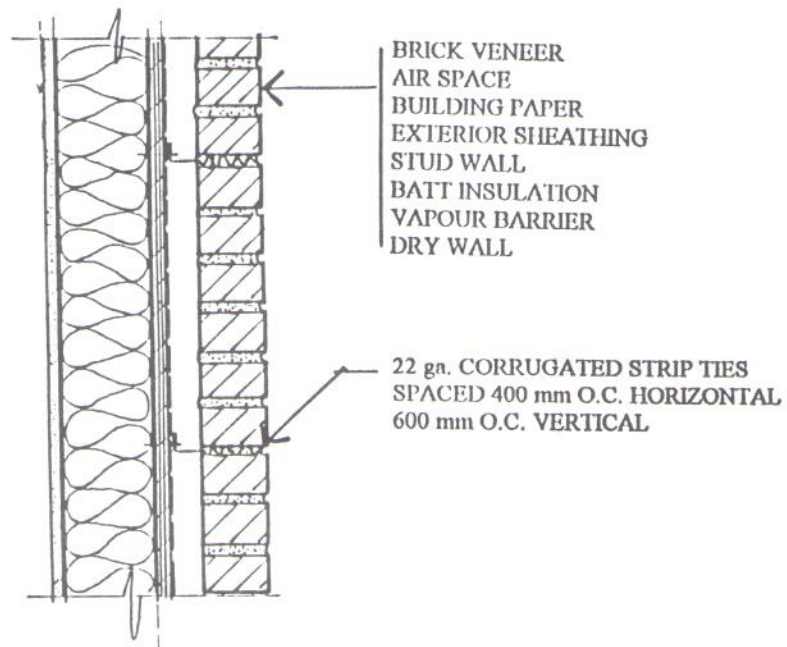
Typical Cross Section of Brick Veneer Steel Stud Wall Assembly of the 1970's and Early 1980's
